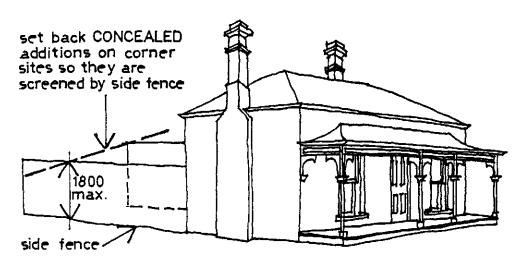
CONCEALED ADDITION DEFINITION FOR CORNER SITE
